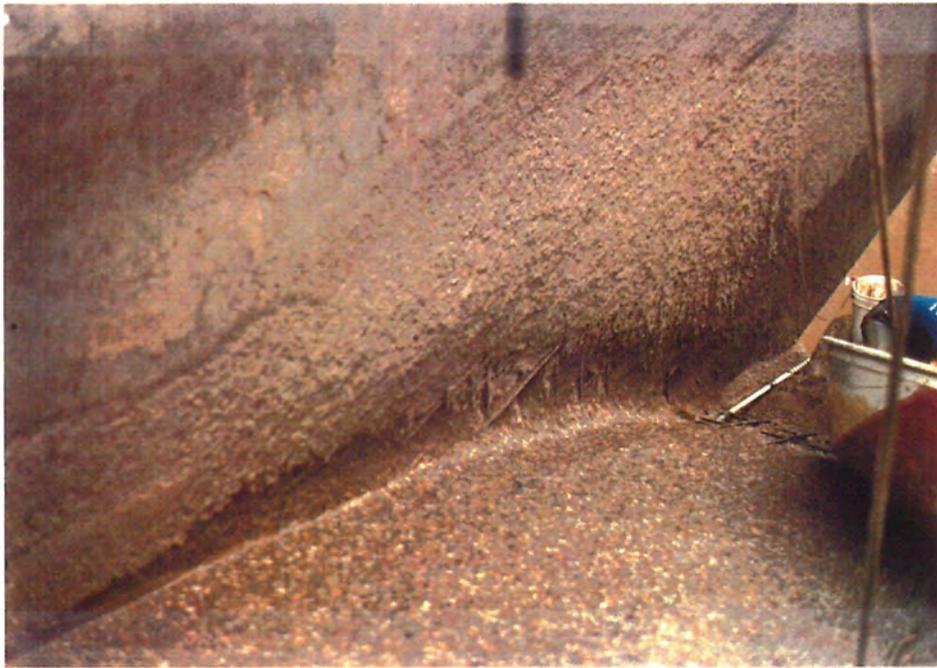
1987 Inspection - Looking downstream at the left wall and floor.
